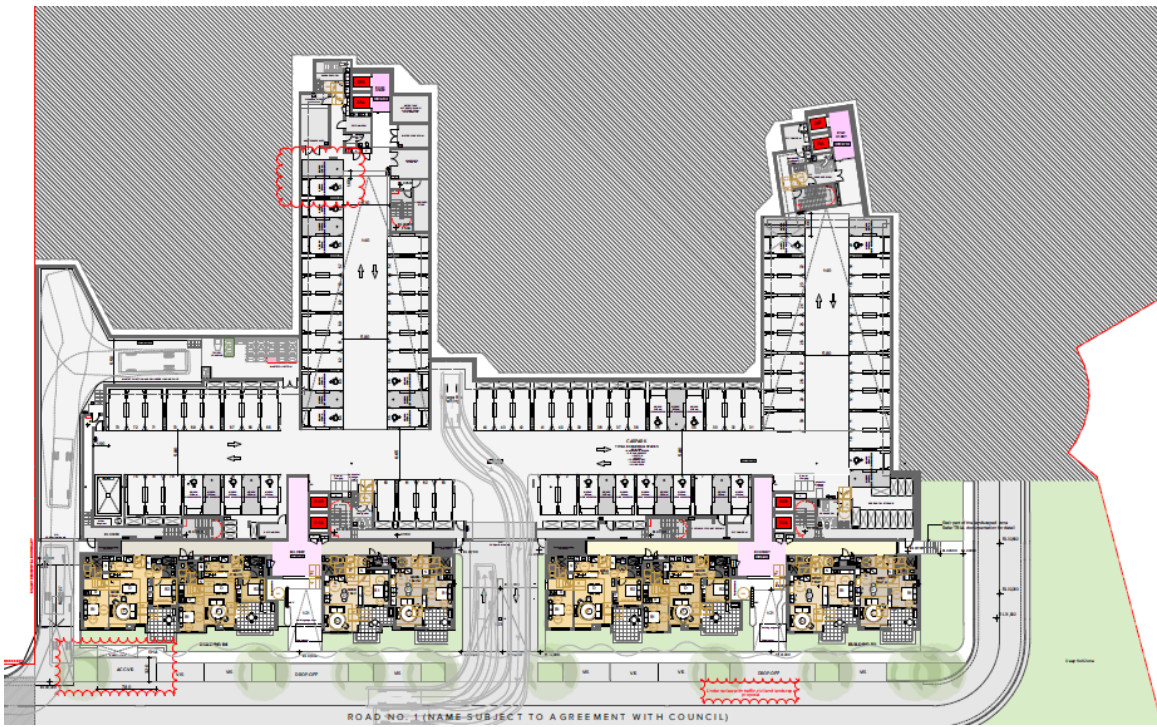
lower-level basement layout showing vehicular access, parking and waste management arrangements
